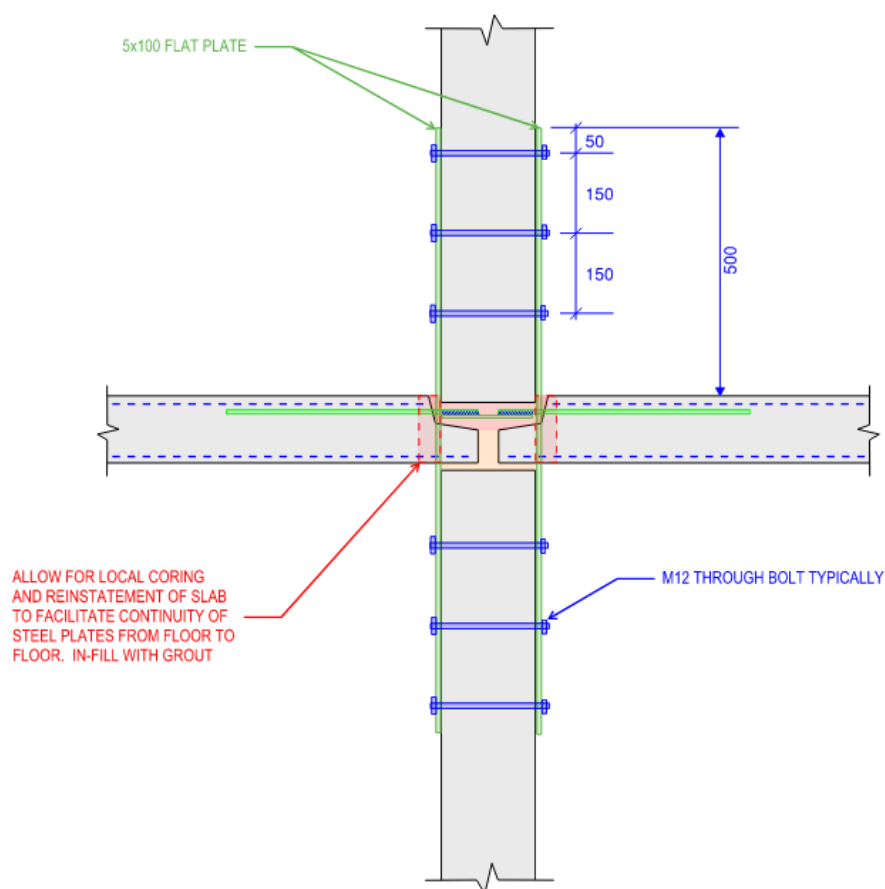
Cross-section view of typical wall-to-wall connection detail with strengthening plate.
